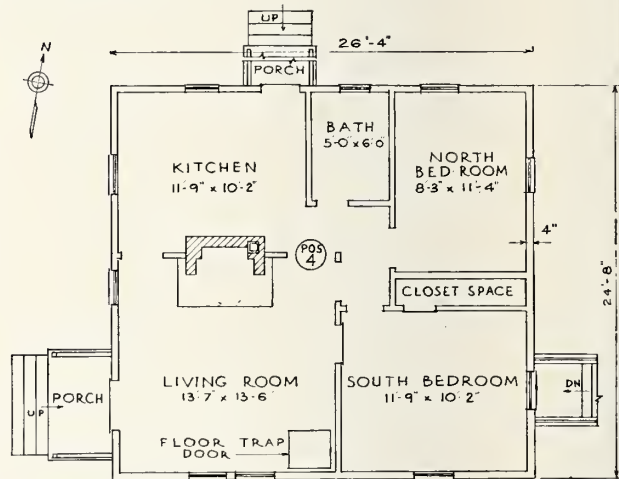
Floor plan of the Test Bungalow showing heater position 4 in temporary opening in living room partition wall and the normal interior door arrangement.
